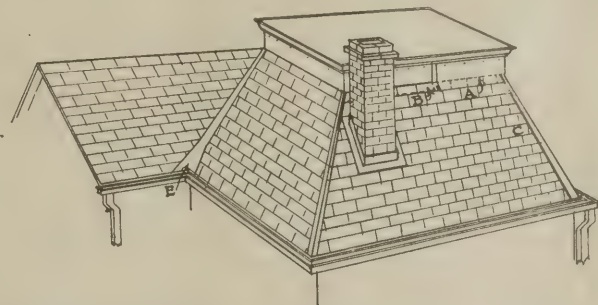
A roof deck. At A is shown a finish with metal overlapping shingles; at B the metal is under the shingles
